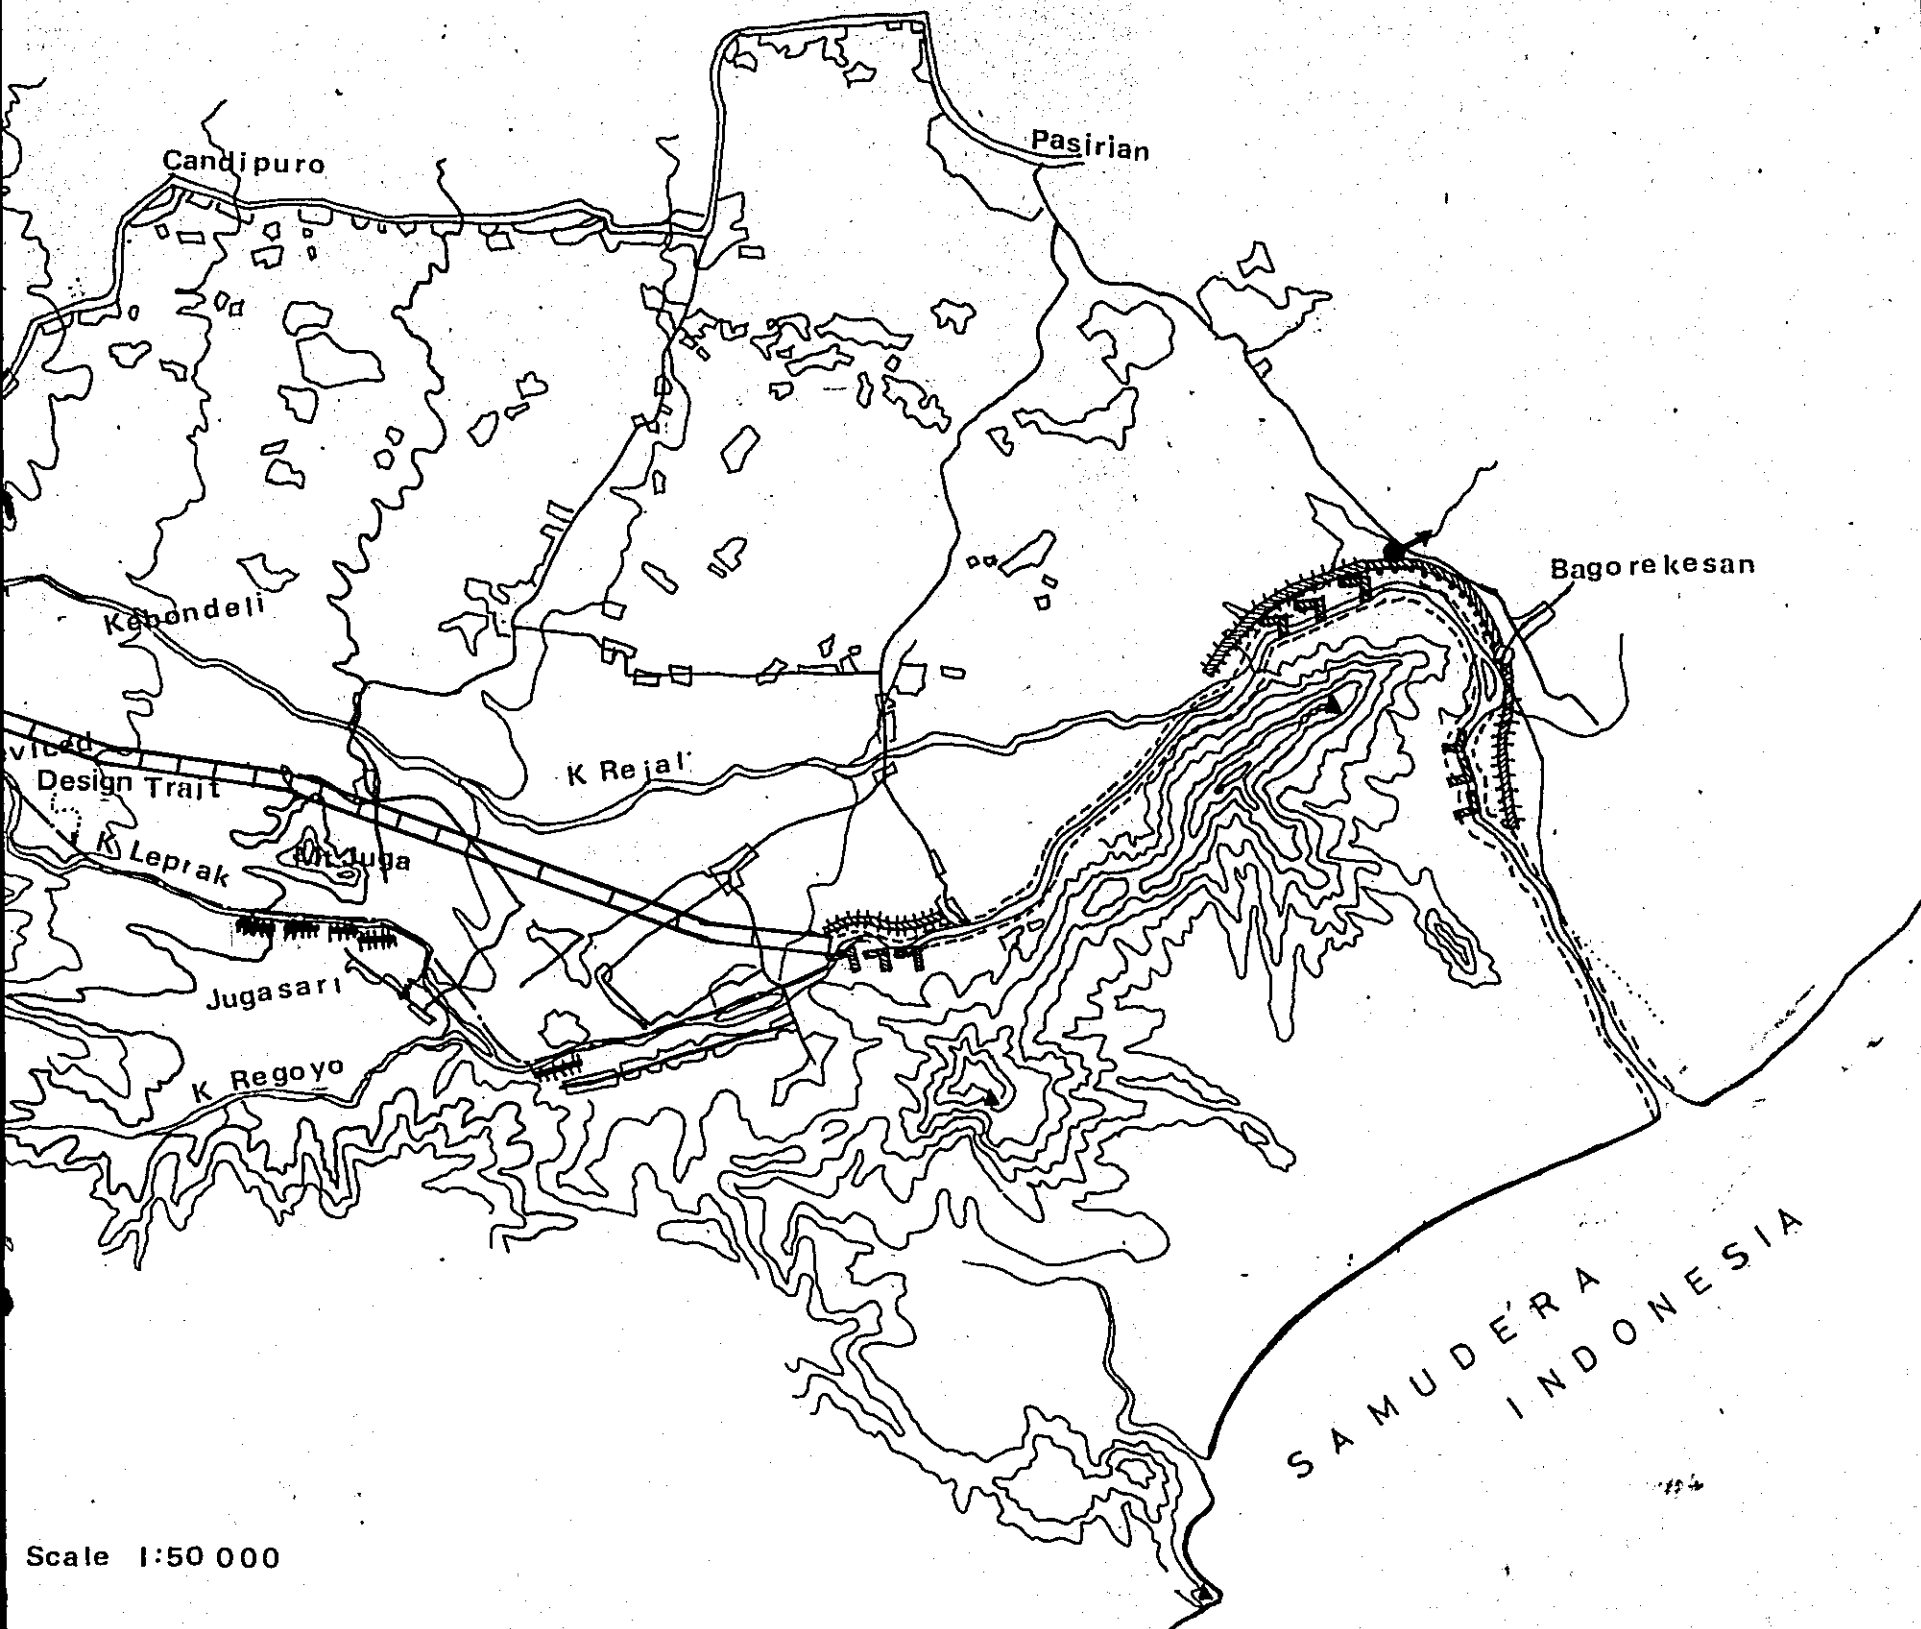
Sediment Control Plan of Existing Master Plan in K.Rejati Scale 1:50 000
